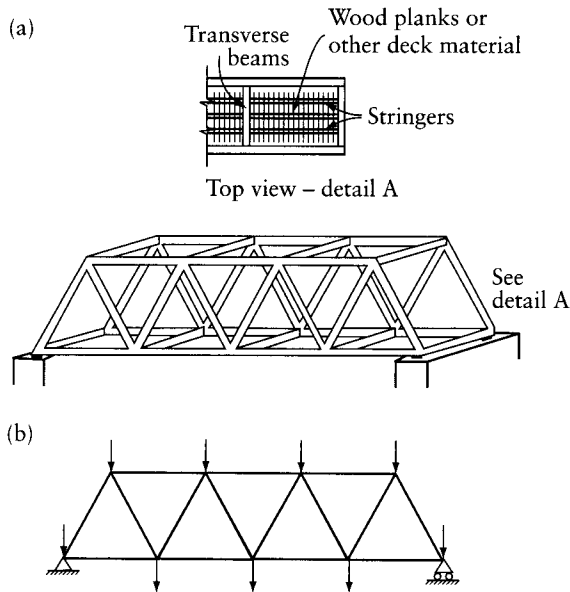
Truss supporting a bridge deck. (a) Pictorial view. (b) Plane truss idealization.
